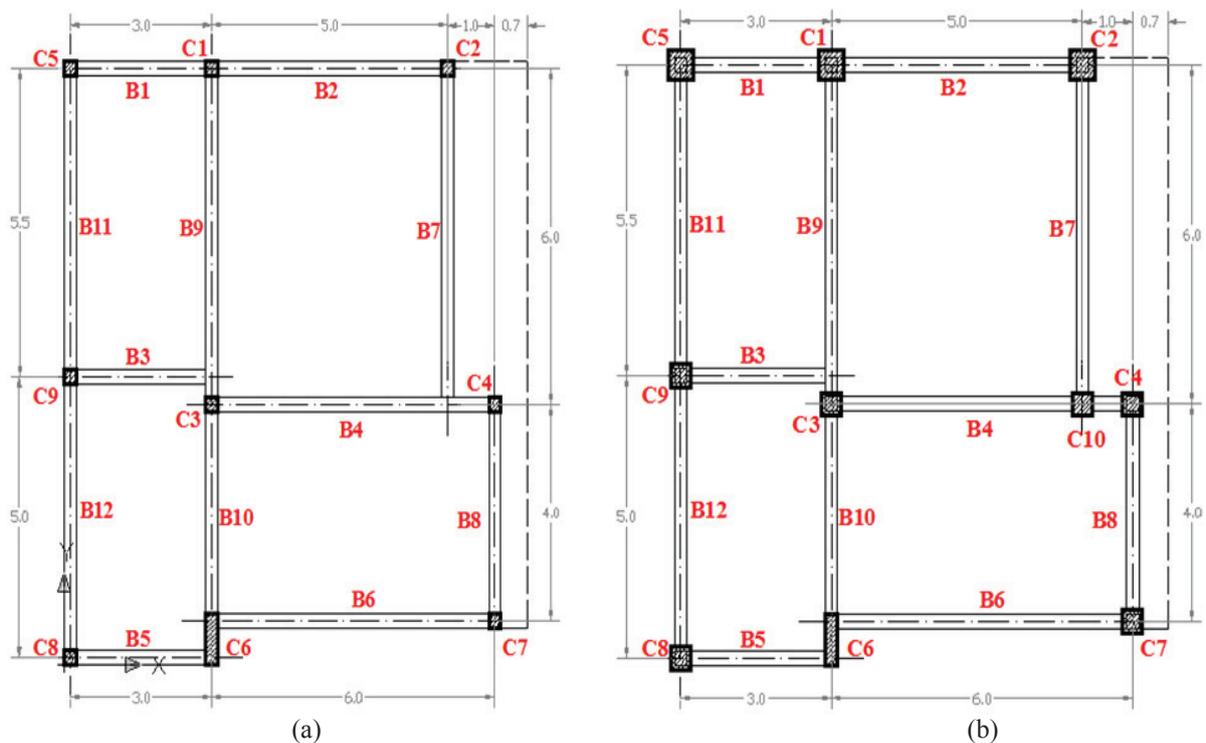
The structure geometry of: (a) initial building, (b) retrofitted building.
